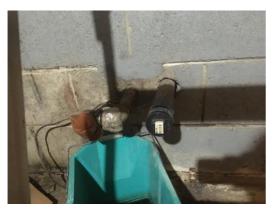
View of the sump located in the basement of Site Building A, facing southwest.
